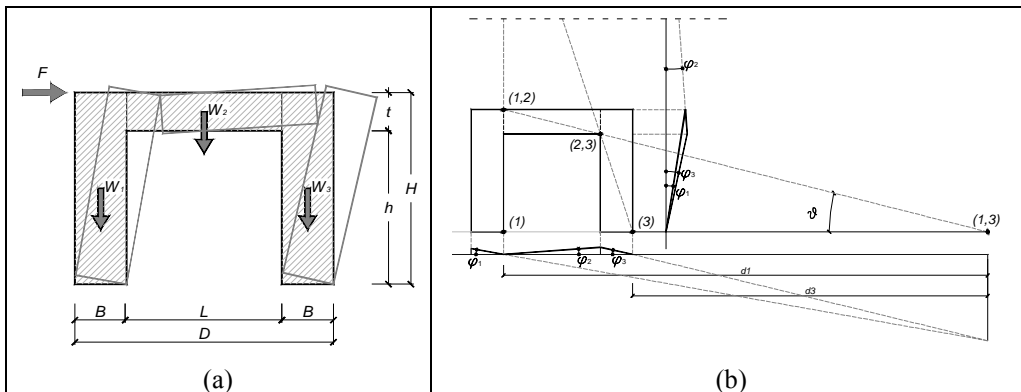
I mechanism – a) geometry and loads; b) kinematic chain.
